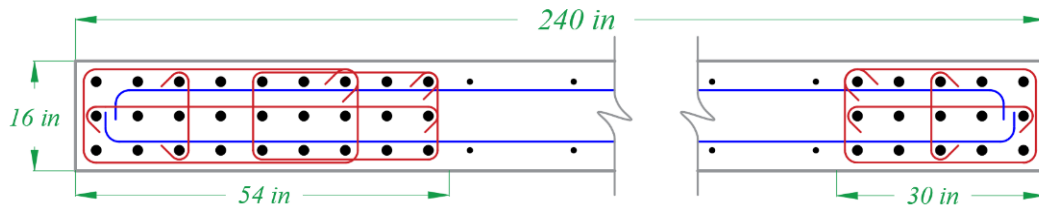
The cross section of wall piers of the coupled wall system in 4.8
